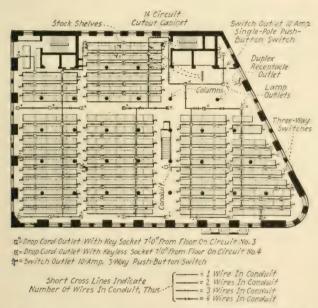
Wiring diagram showing conduit installation of three-way switches in second-floor stockroom of Cluett-Peabody Company, Chicago. L. H. Lamont & Co., Contractors.
